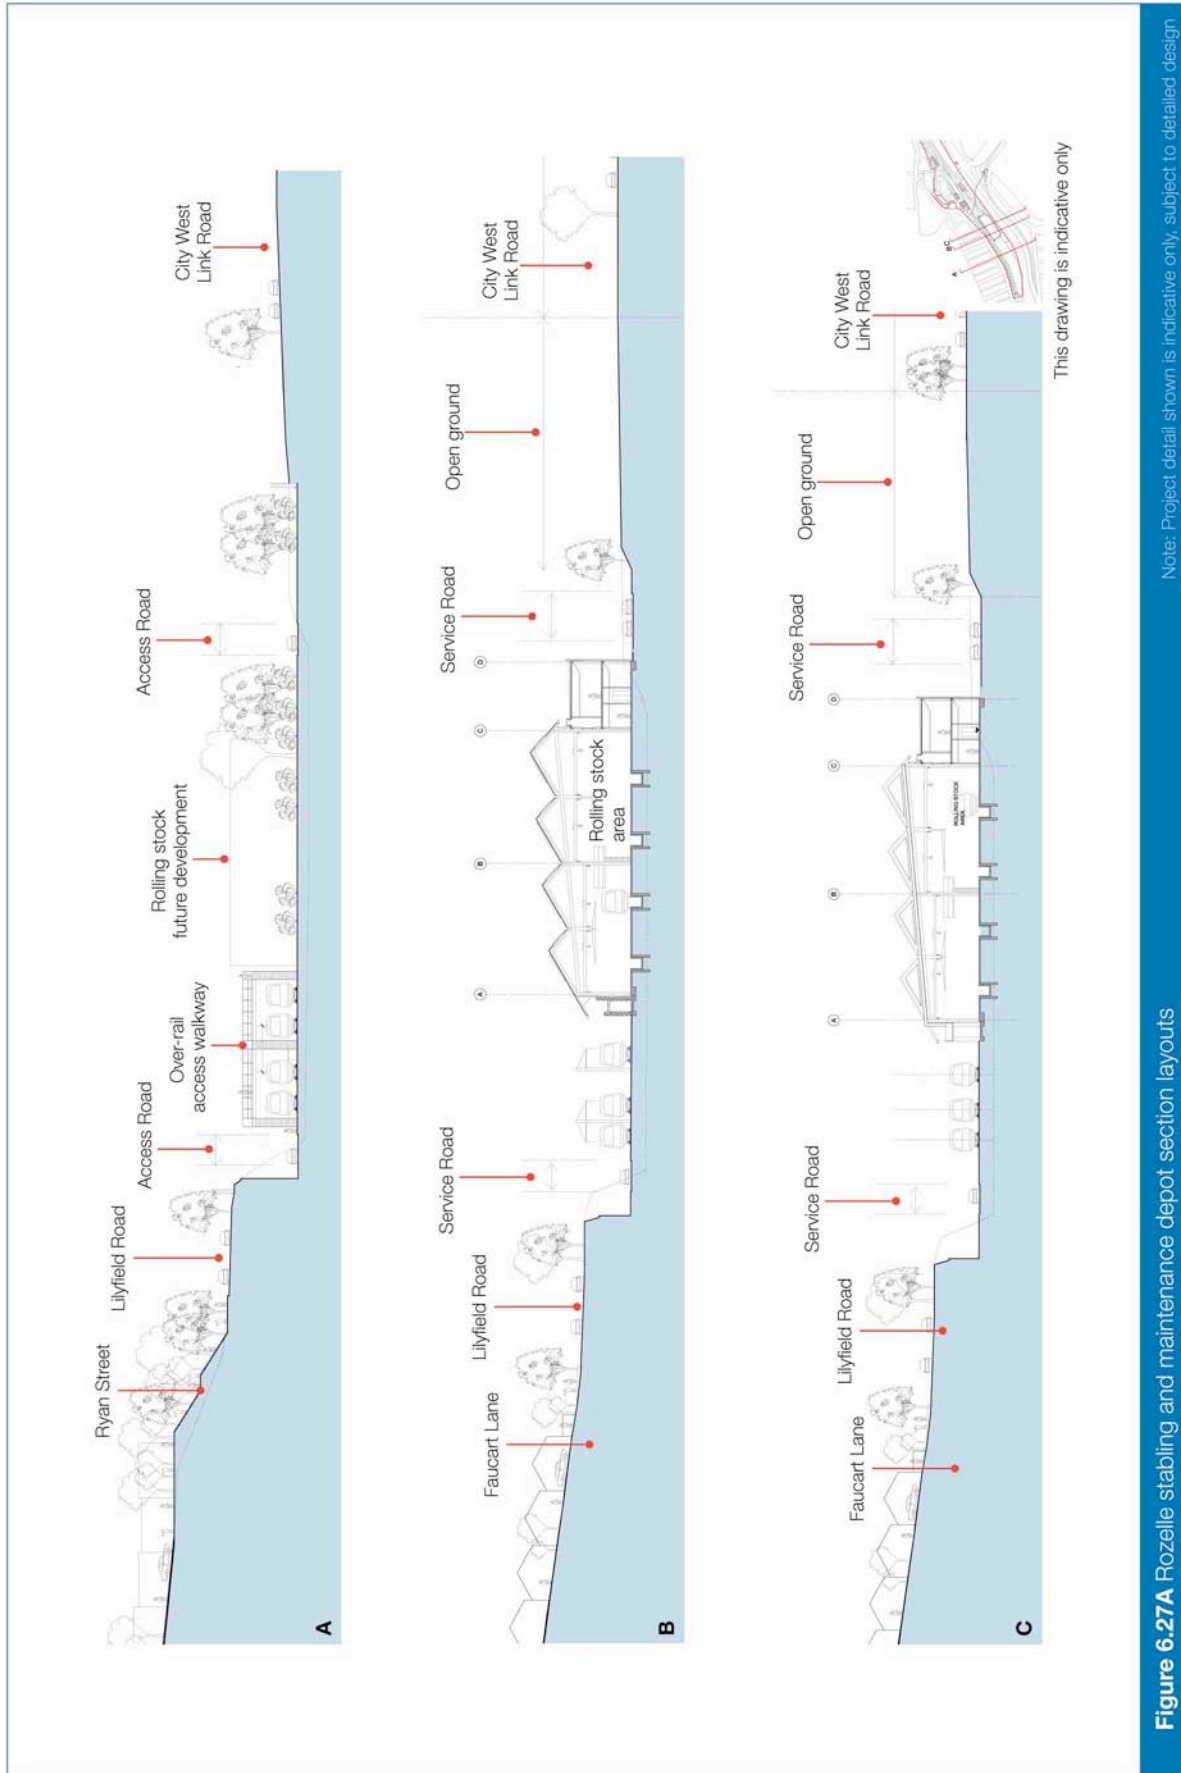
A Rozelle stabling and maintenance depot section layouts
